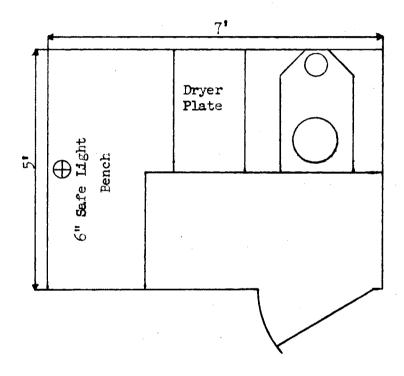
DARKROOM FLOOR PLAN CUSHING DAILY CITIZEN
